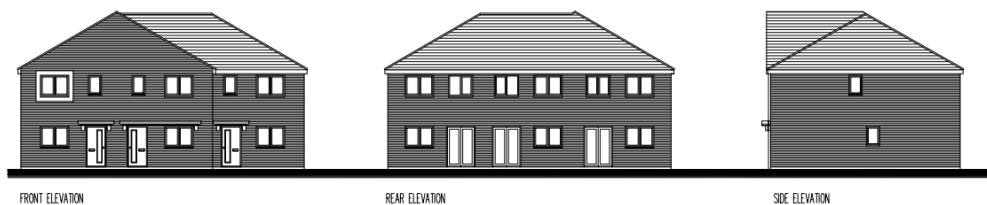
Example of house type B79 - frontage on Yardley Wood Road along plots 10, 11 and 12
